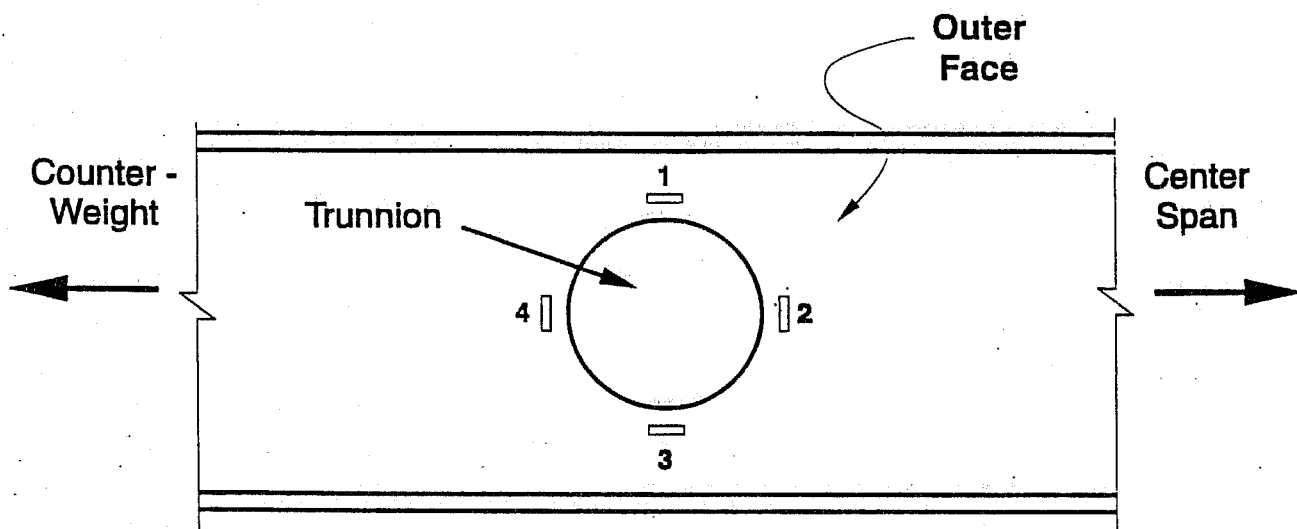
Strain gage locations and designations for instrumented trunnion areas on the Brandon Road bascule bridge.
